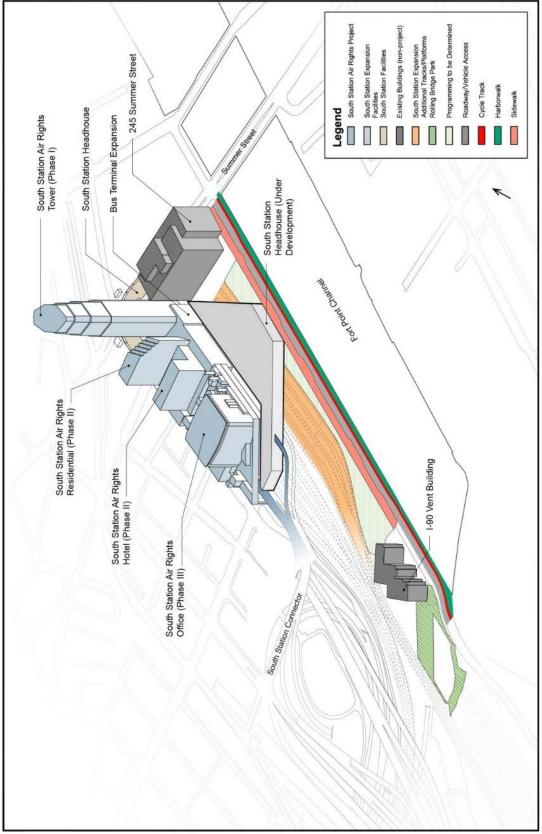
South Station Site Joint/Private Development Alternative 1, Massing Concept
